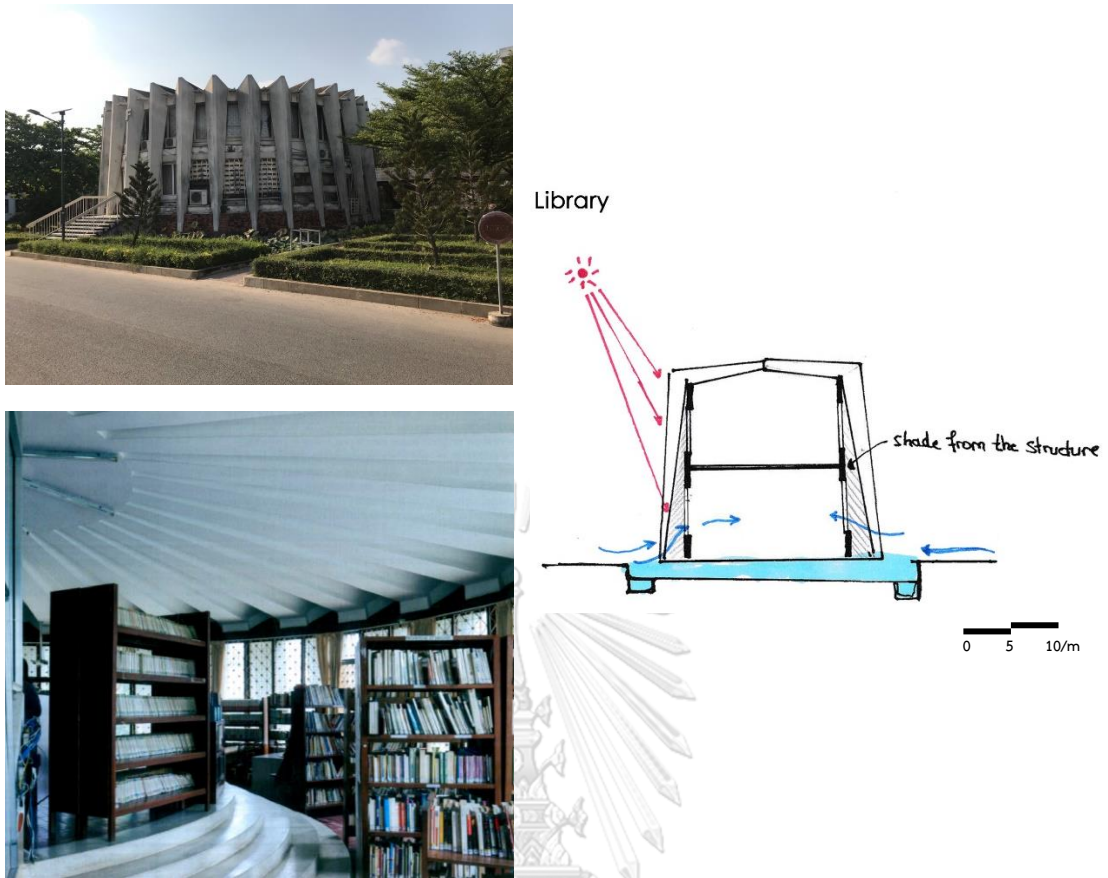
43 . The library design reveals the structure to the building's outside; it used for shading the building and is surrounded by a water body to allow a passive cooling design
